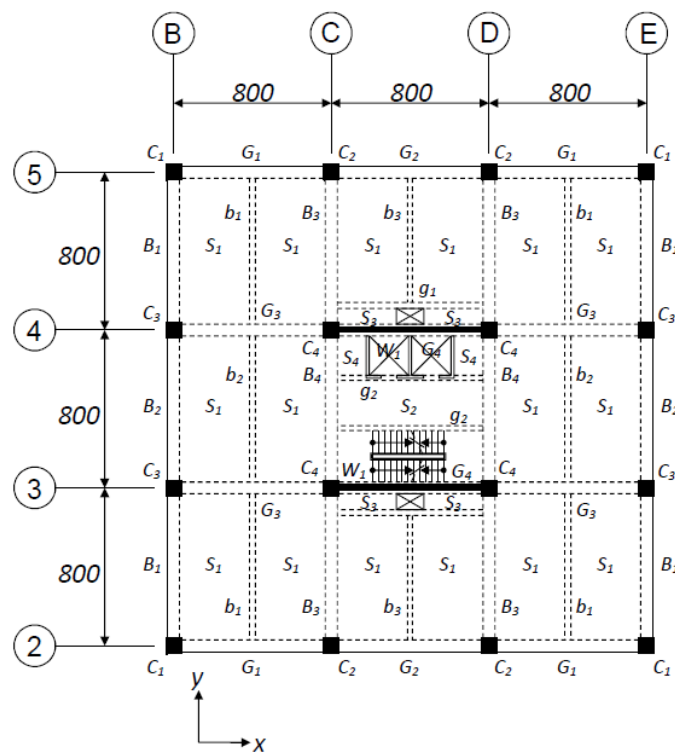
Ten-story residential building floor plan layout (Yeh and Chou 2017)
